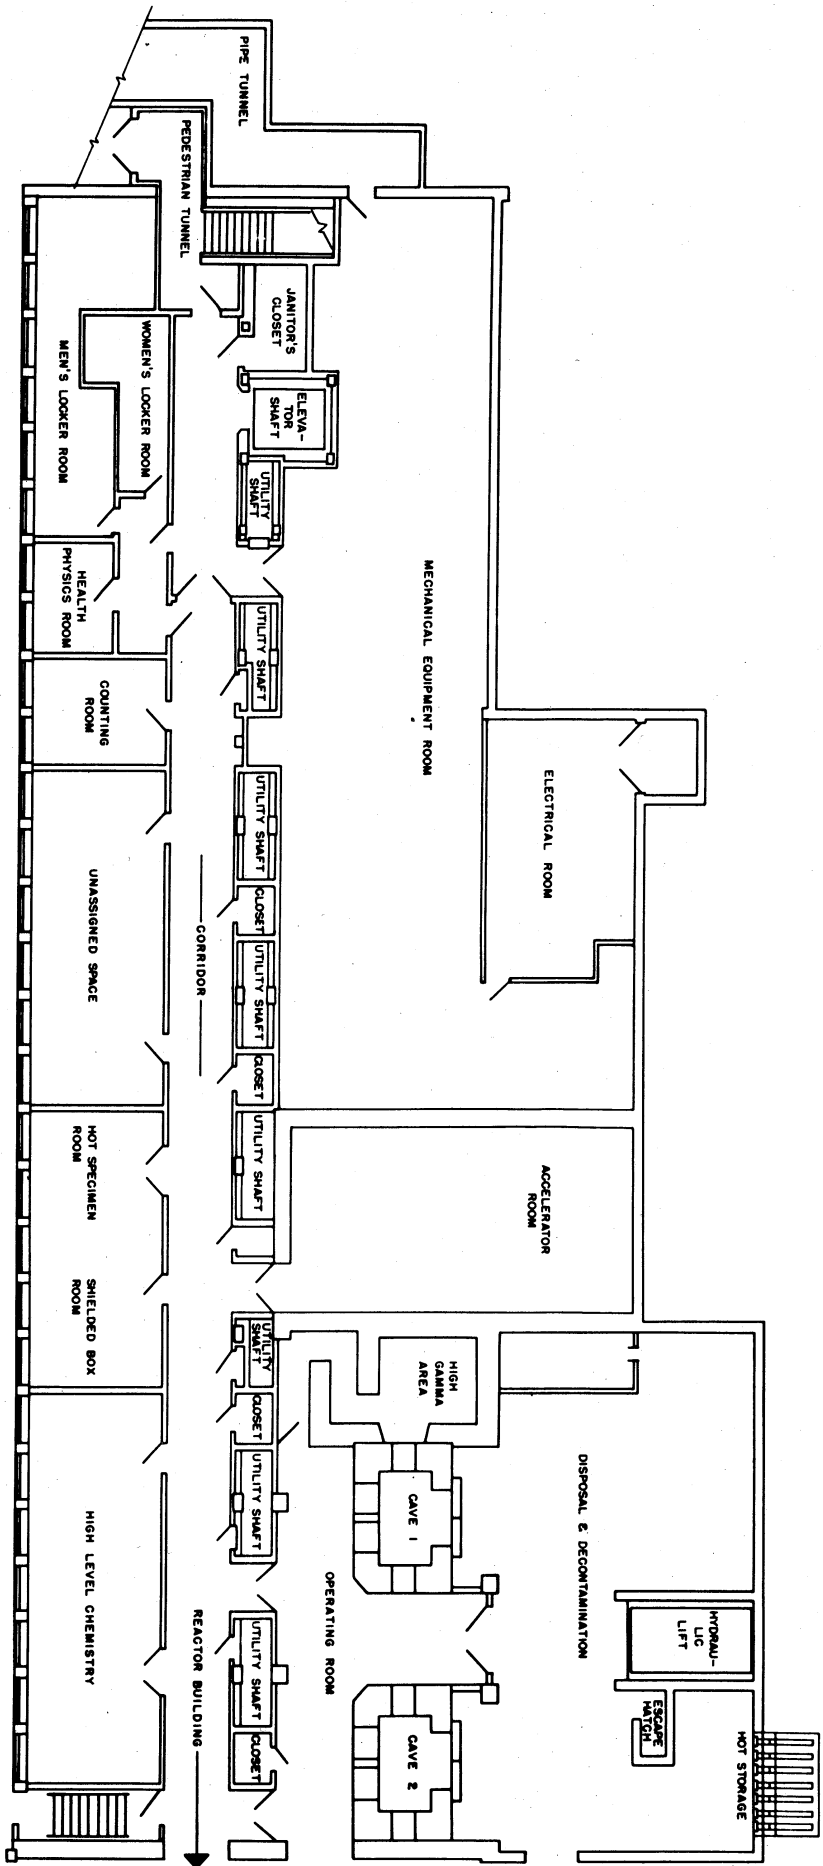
Michigan Memorial-Phoenix Laboratory hot-lab floor plan
